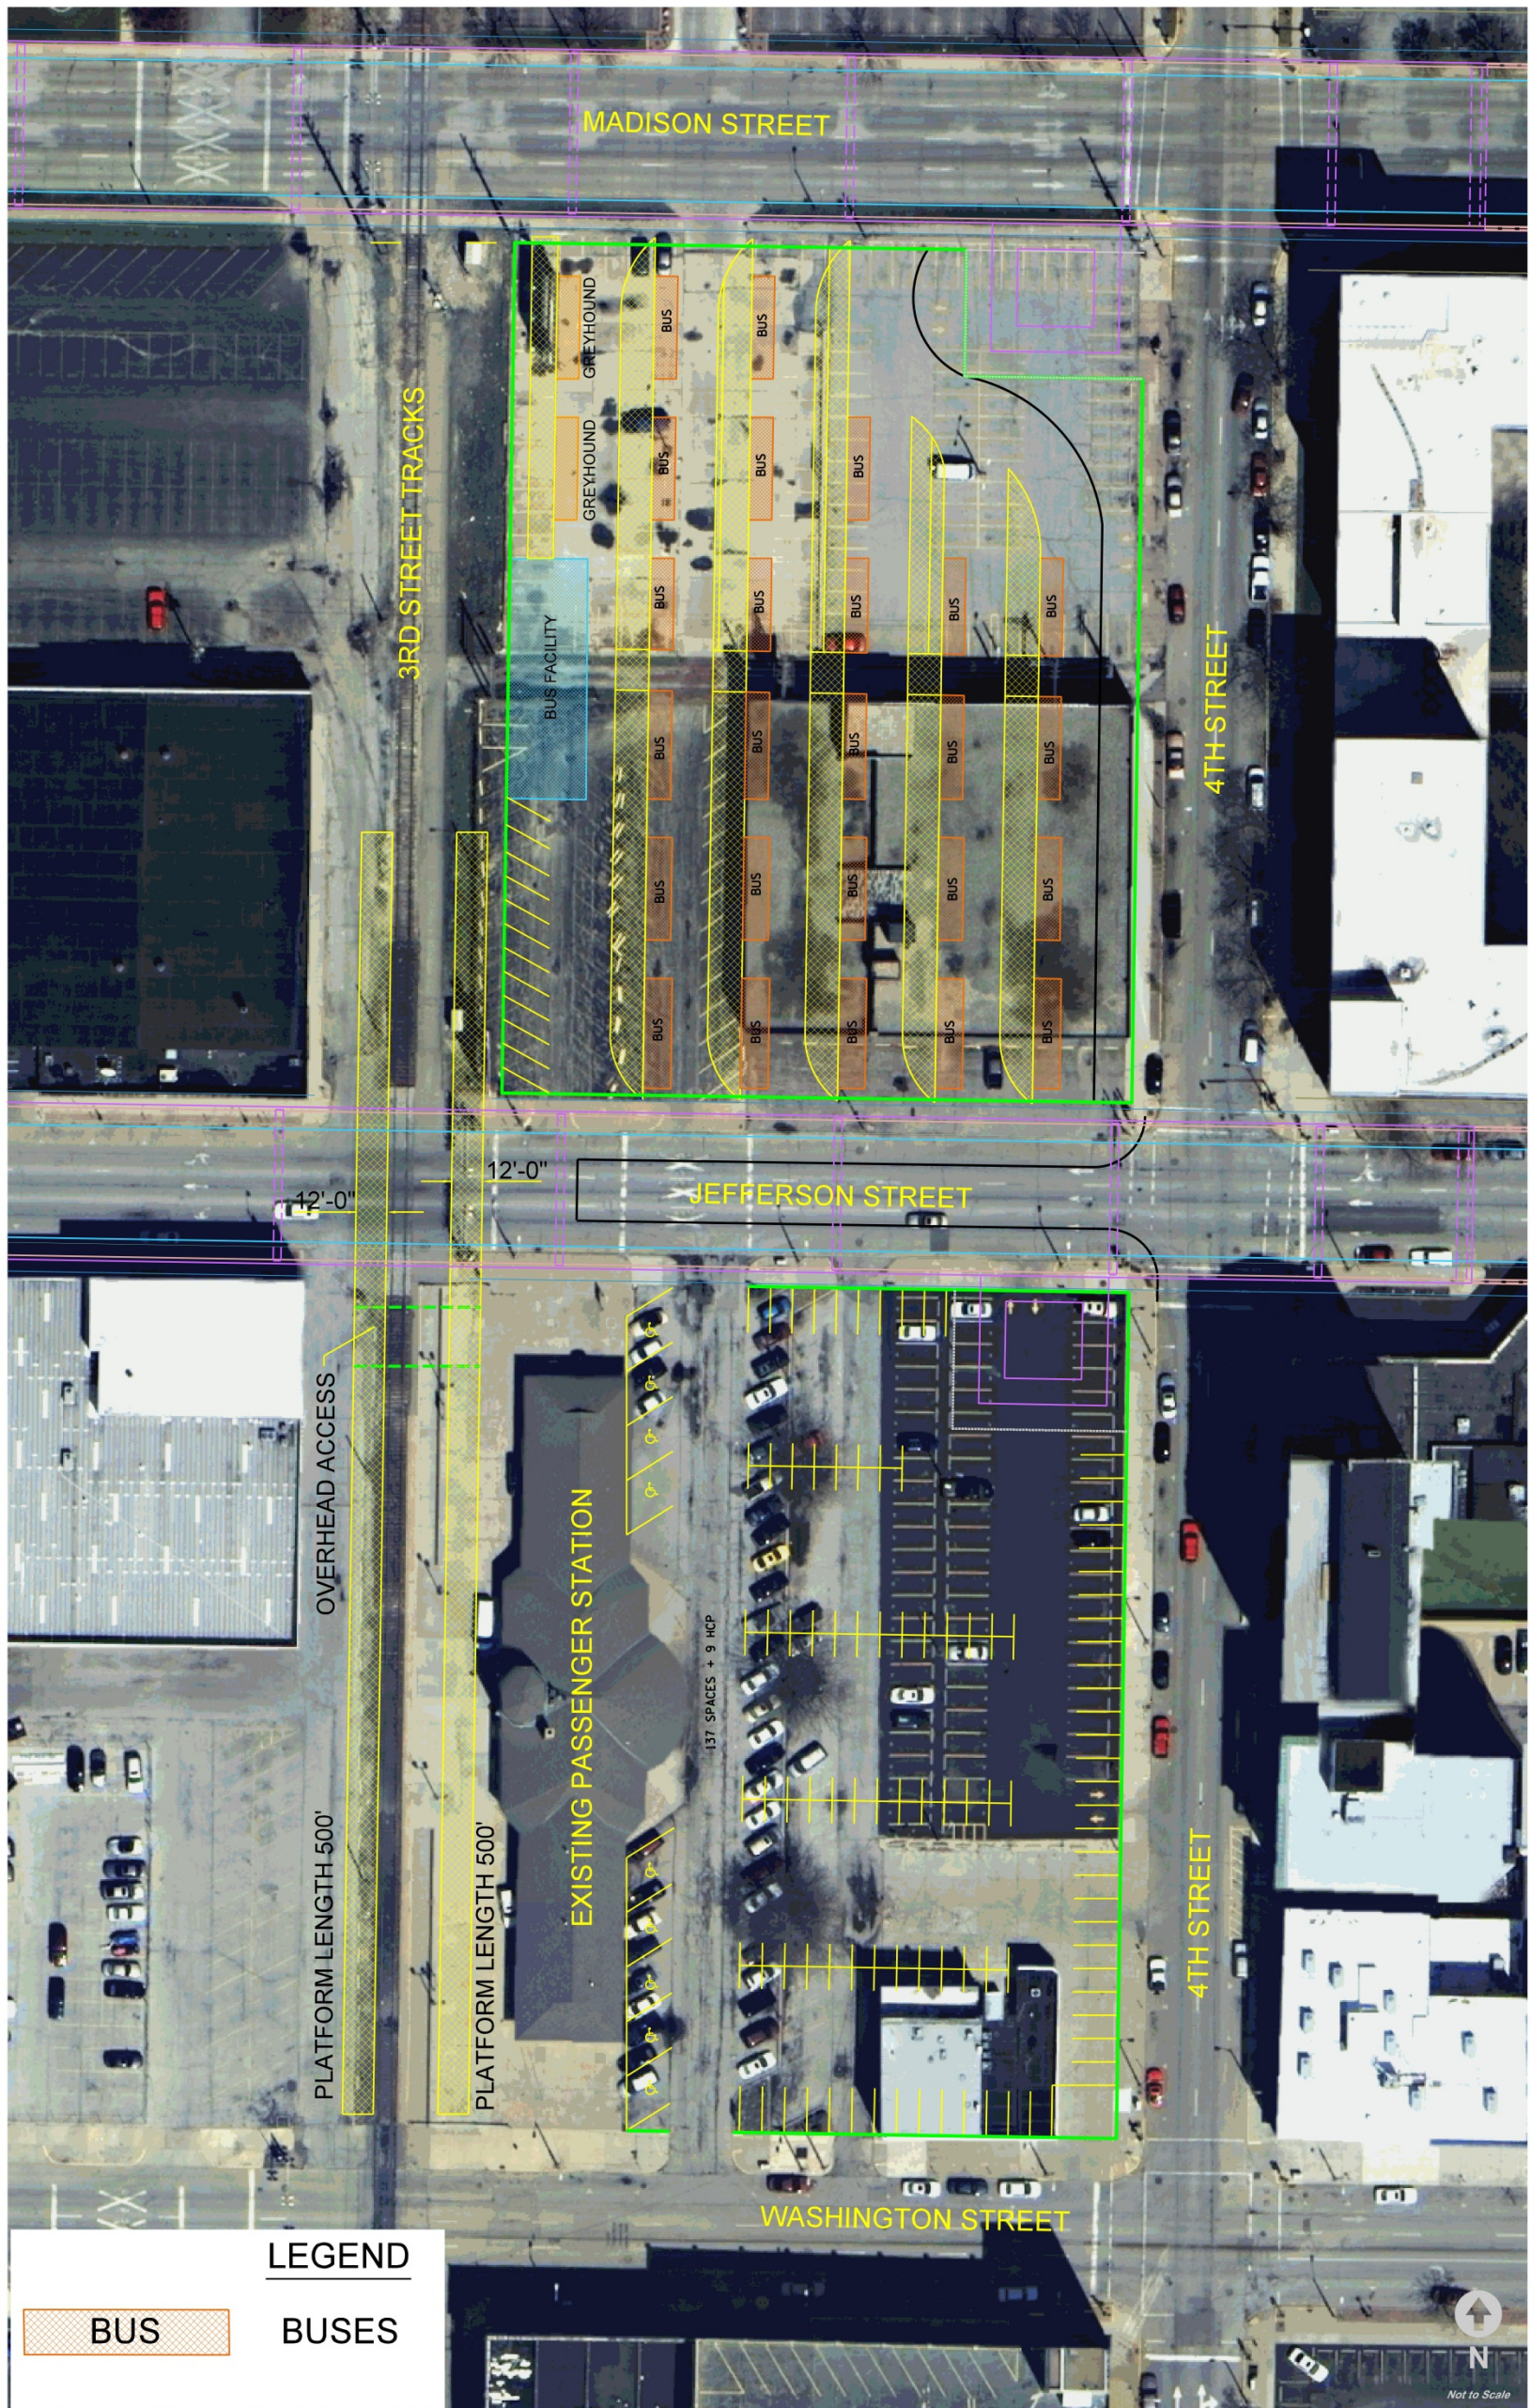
Passenger Station on 3<sup>rd</sup> Street
